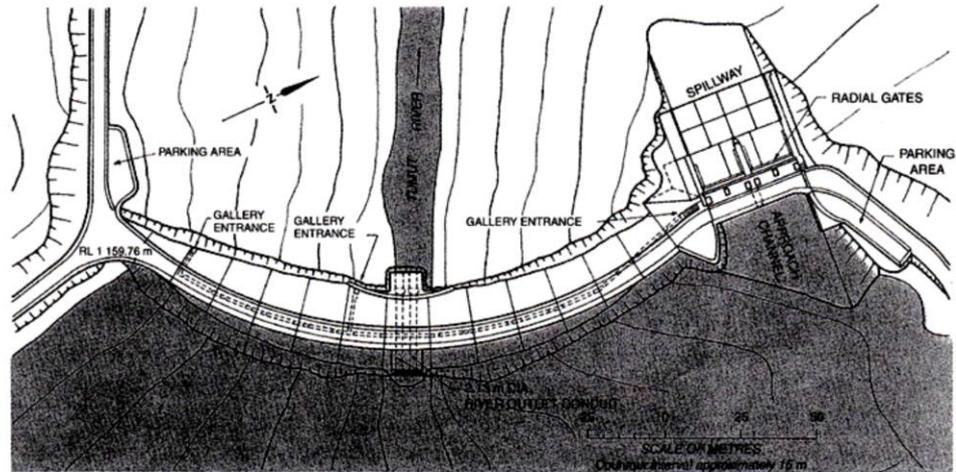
Typical arch dam plan (Fell et al., 2015)
